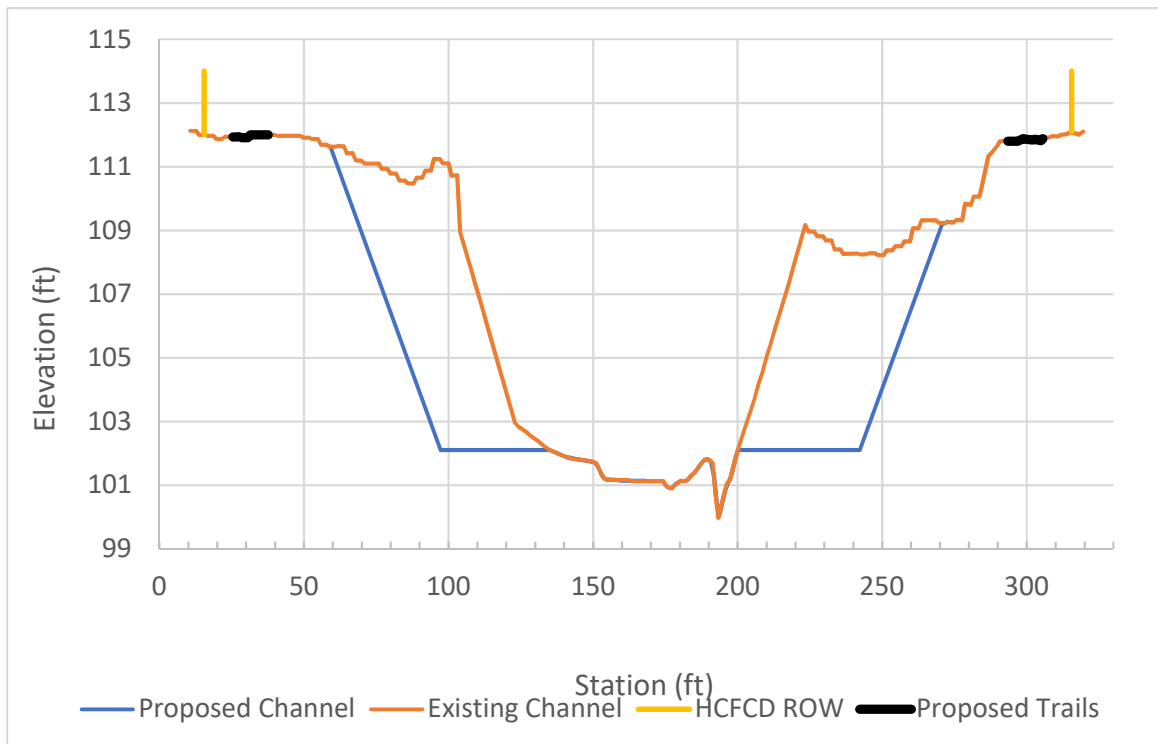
Typical Channel Improvement Section for Alternative 1, Scenario 1A
